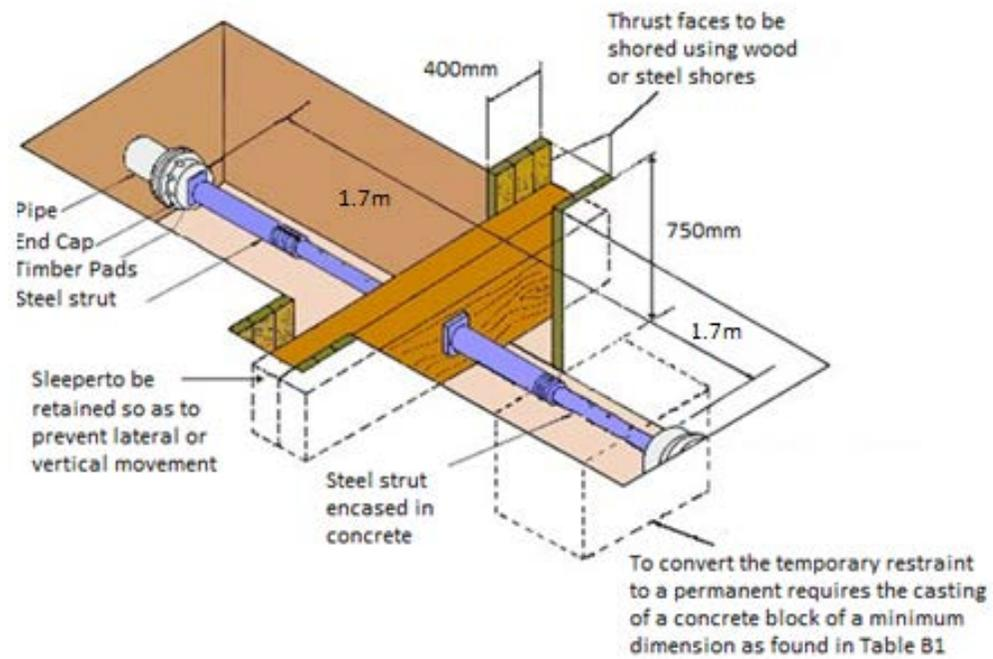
Conversion of Steel Struts from Temporary Anchorage to Permanent by Casting a Concrete Block
